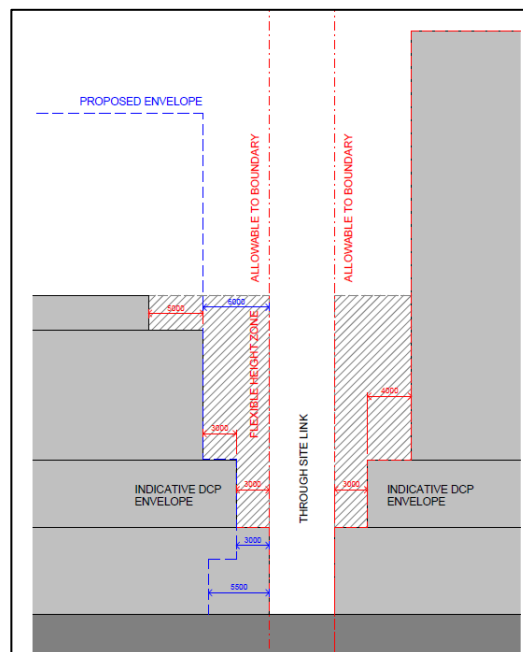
Section showing the DCP envelope and the proposed building envelope
